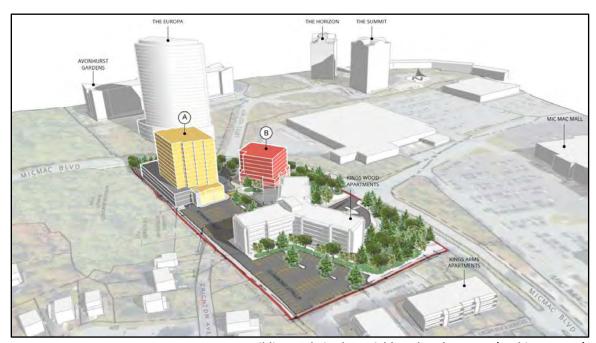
Building Scale in the Neighbourhood Context (Architecture49)
